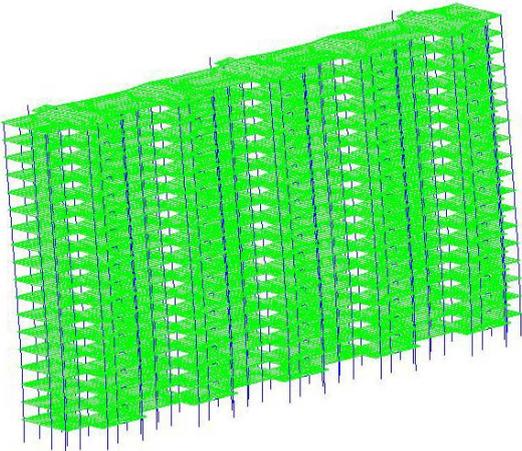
Deformed shape of a high-rise reinforced concrete moment frame – shear wall (core) building during pushover
